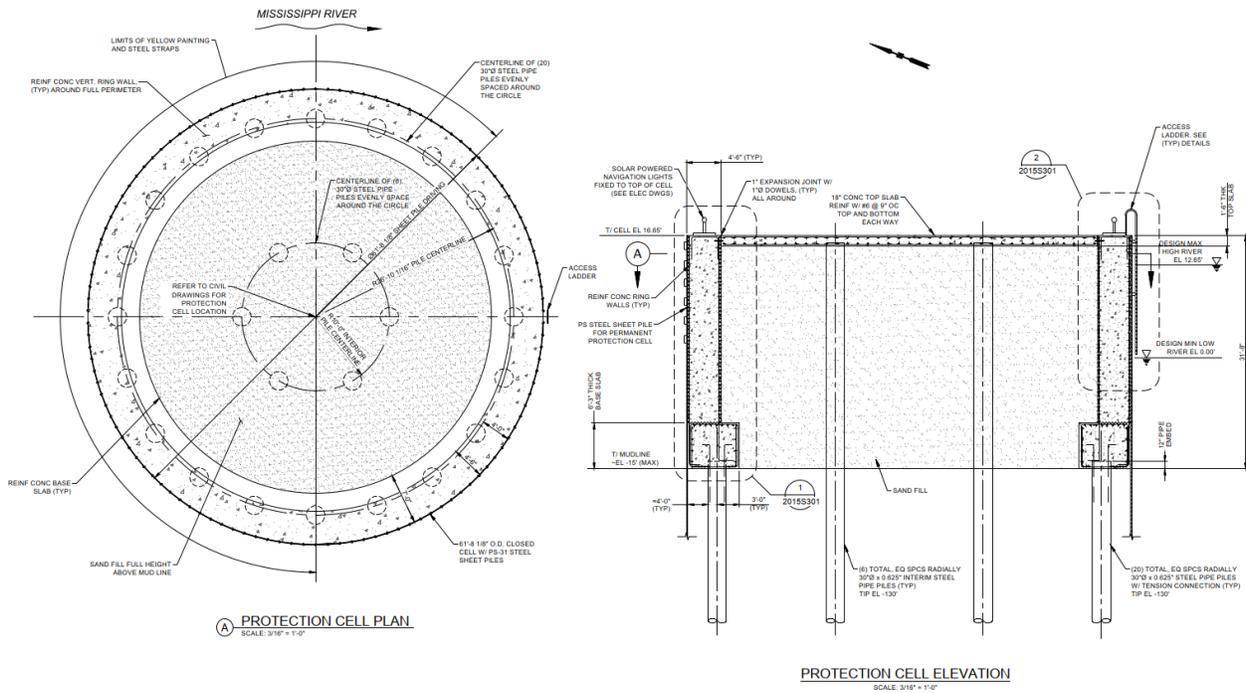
Intake Protection Cell Plan and Elevation View
